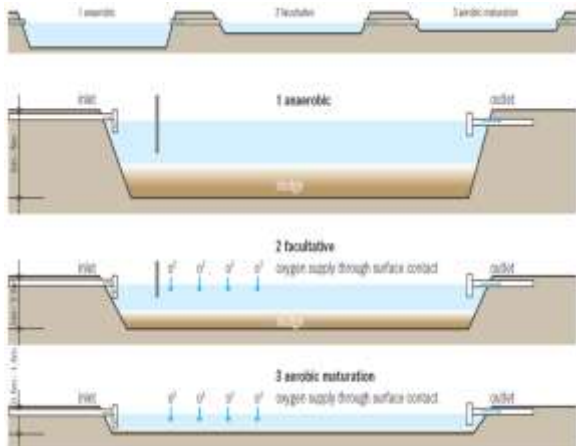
Schematic sections of Waste Stabilization Pond
